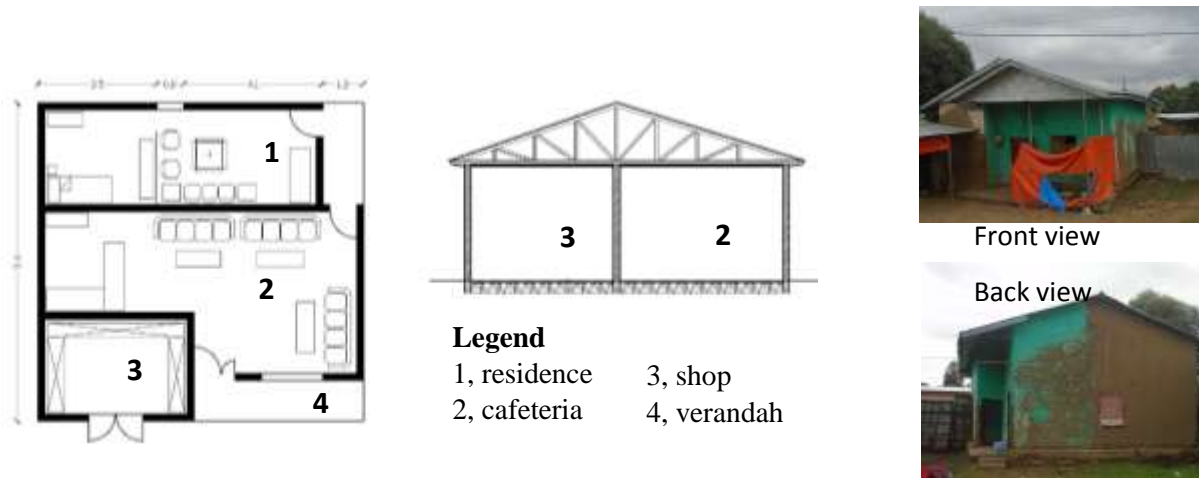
W/ro Degnesh's rental commercial building plan, section and pic
